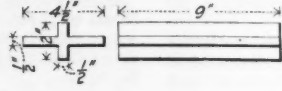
Dimensions of full-sized Key used on R. F. & P. Ry. for Stringers consisting of two pieces 9x15, superimposed.
